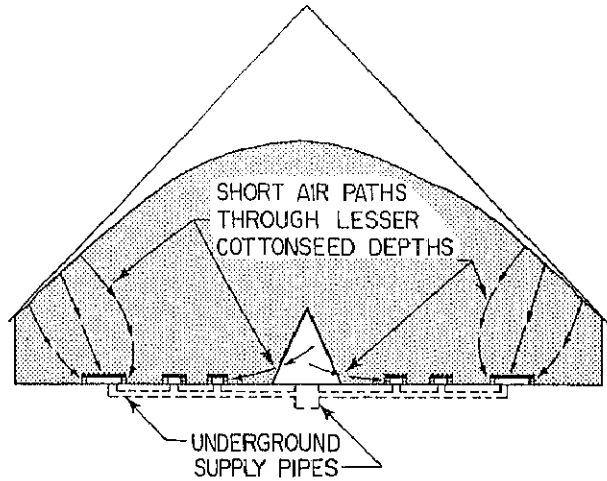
Peak-loaded storage with pallets located too near the tunnel and too near the outside walls in shallow cottonseed. Air short circuits from the tunnel and through the shallow seed.
